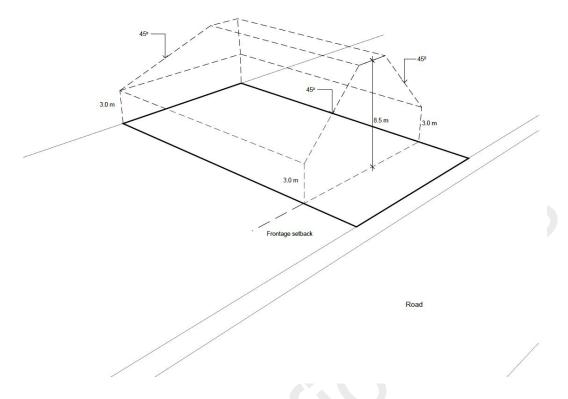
Building envelope as required by clause 8.4.2 A3(a) and clause 8.5.1 A2(a)
